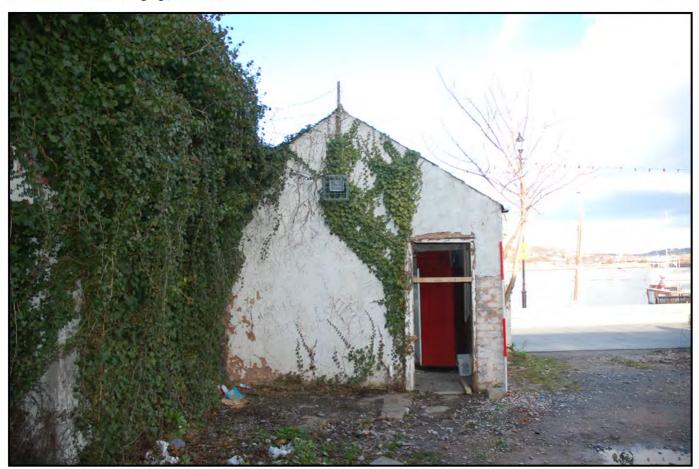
YARD 3 (PRN 30458): Building 13: west facing access door. Note, Building 13 (PRN 30462) constructed from brick. (Ranging pole: 2.0m)
